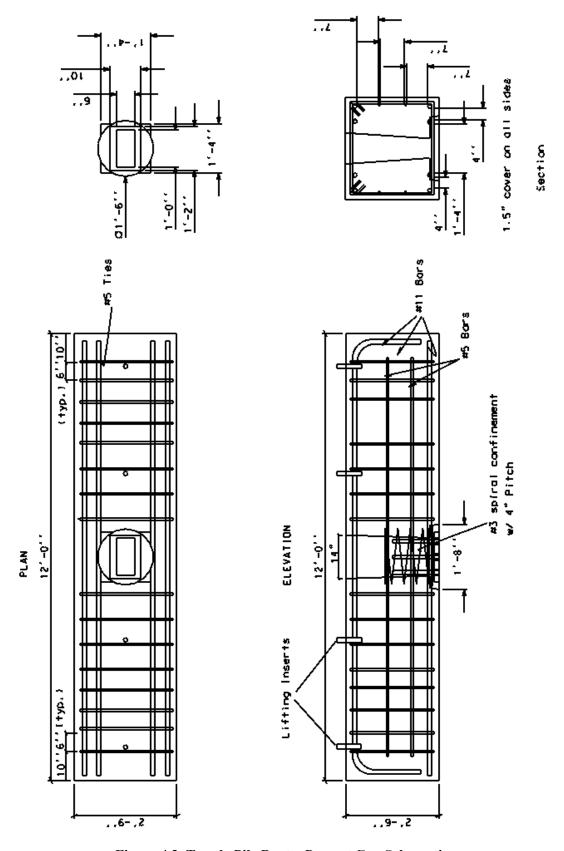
Trestle Pile Bent—Precast Cap Schematic
